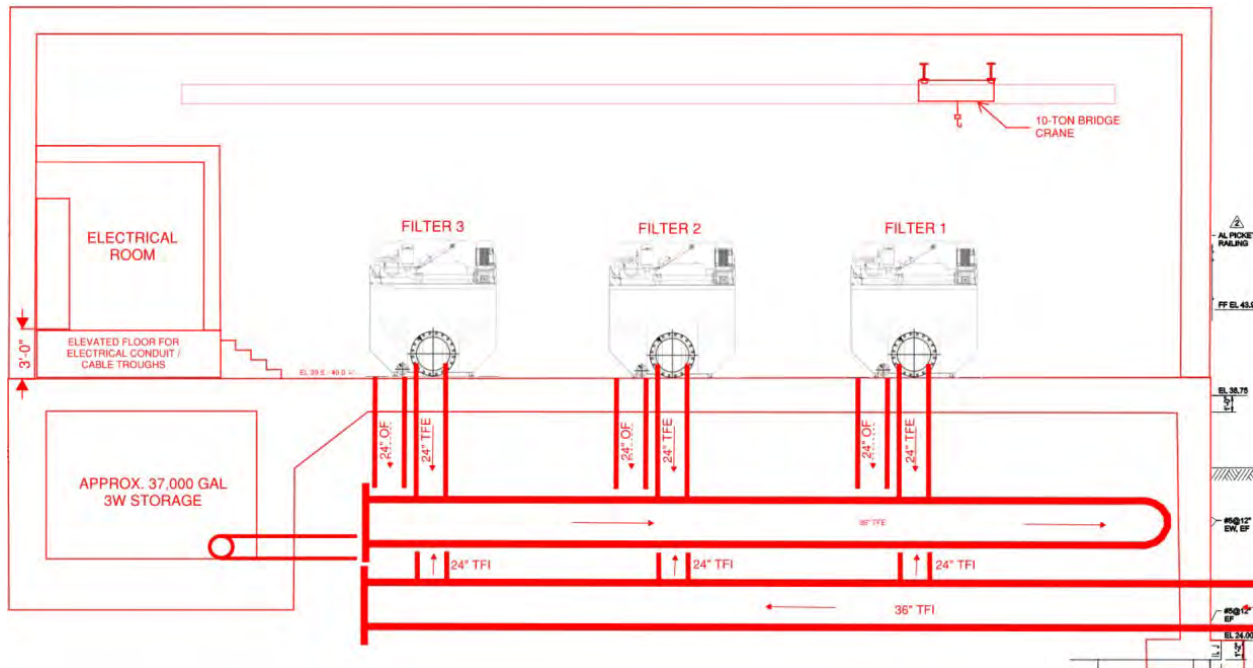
Tertiary Filtration Facility Conceptual Layout - Section View
